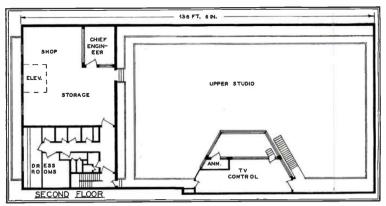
UPPER PART OF WDSU STUDIO BUILDING DOES NOT EXTEND OVER FM-AM STUDIO SECTION
